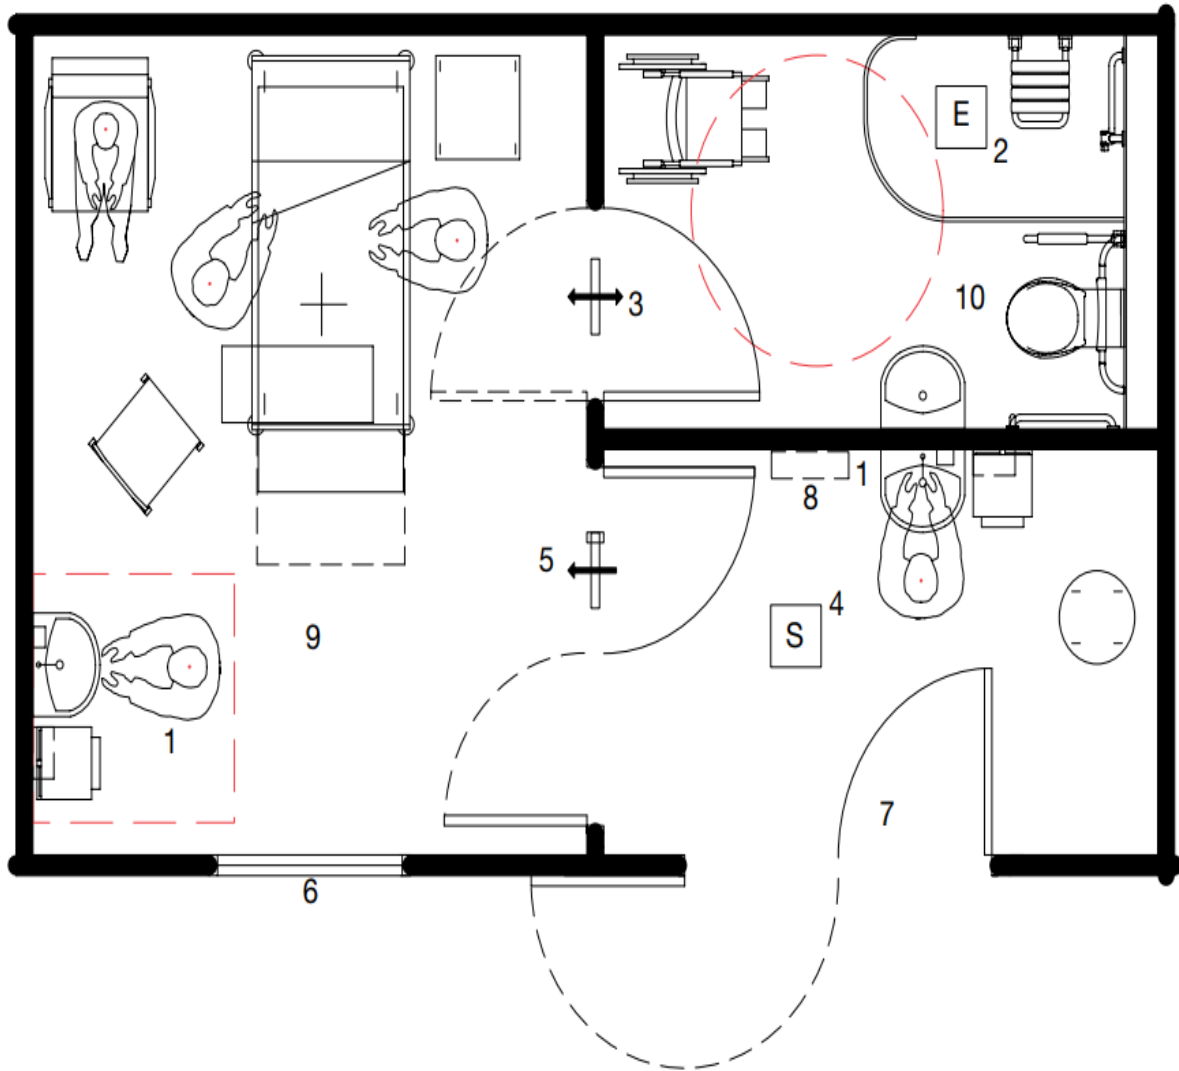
A two-bed room has been converted into a single-bed isolation room with en-suite facilities. No. 6 represents an observation window while no. 8 is a Personal Protective Equipment (PPE) dispenser. See reference 3 for details.
